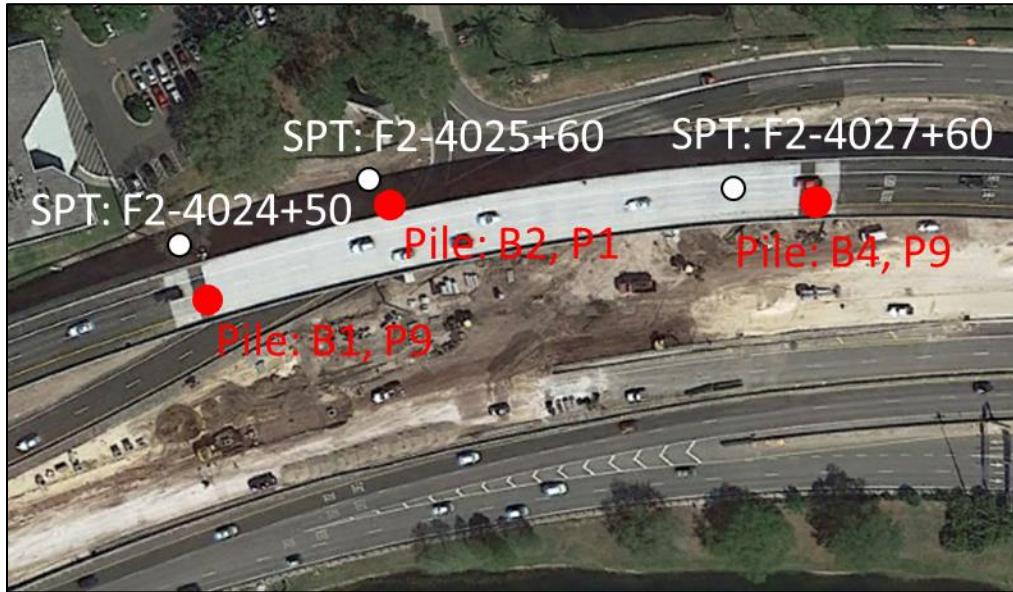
Test pile and SPT boring locations for JTB and I-95 (Bridge 720817)
